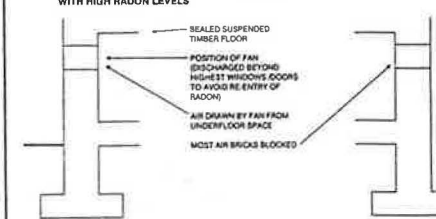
USE OF FAN SYSTEM TO EXTRACT AIR UNDER AN EXISTING RAISED TIMBER FLOOR IN DWELLING WITH HIGH RADON LEVELS
